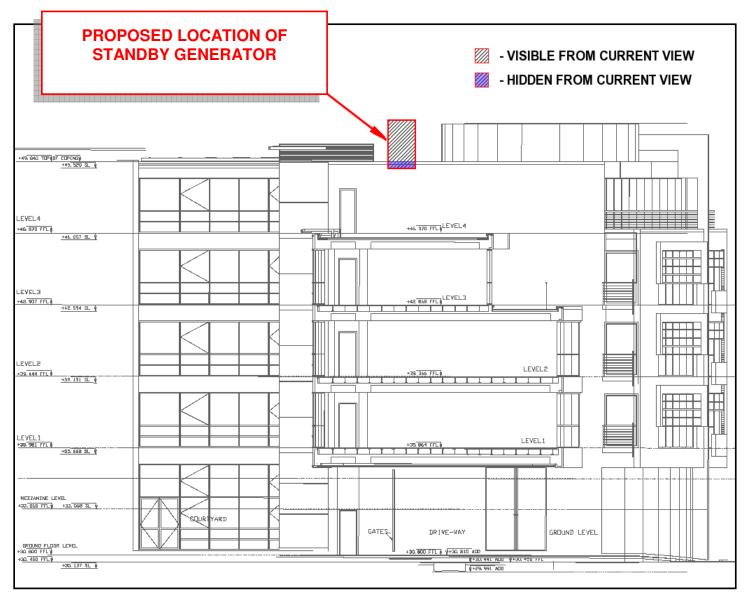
Section Drawing of "The Iceworks" (Not to Scale)
